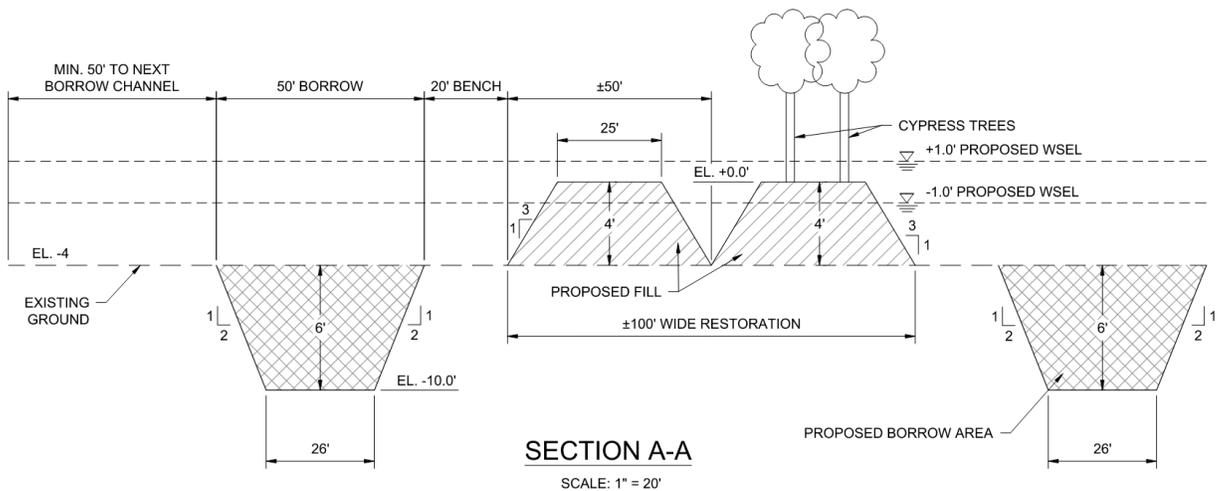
Bottomland Hardwood Forest (Typical Section)
